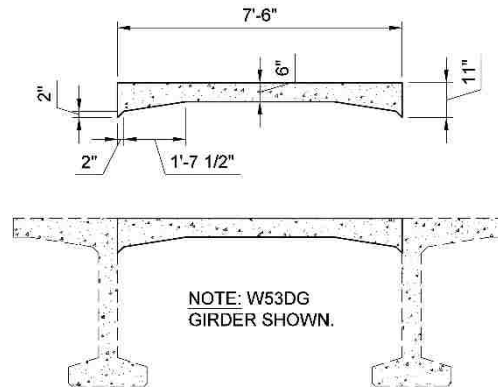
Typical deck cross-section dimensions shown for the eight-foot girder spacing. To capture the effect of the variable deck thickness, 8-node solid elements were used. Boundary conditions are discussed in Section 4.2.
